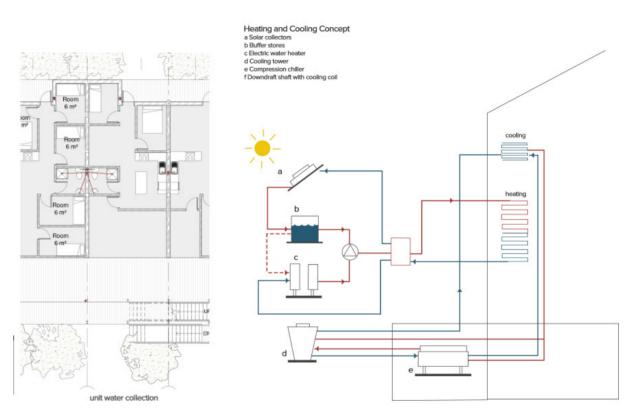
Grouping of services on plan (left) and water pipe system as space heating (right) (Author).
